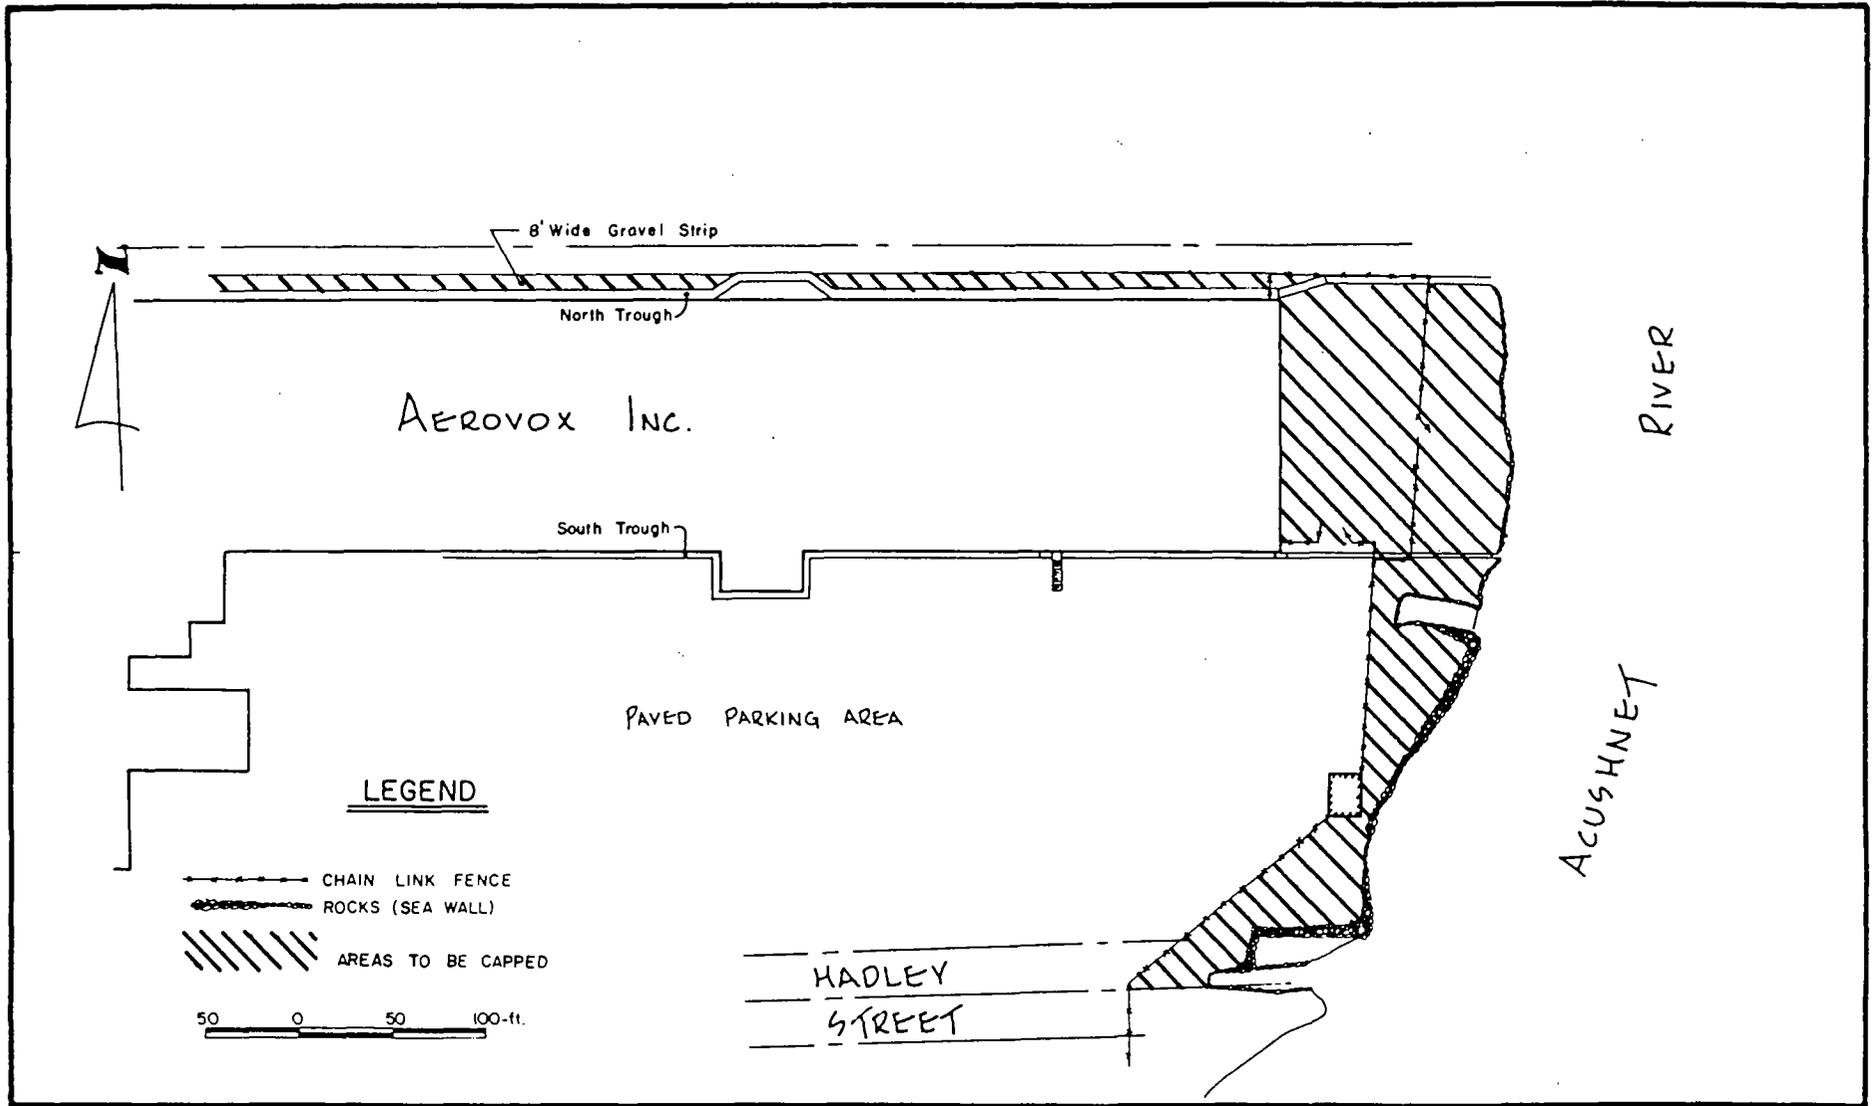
SITE PLAN SHOWING AREAS TO BE CAPPED
